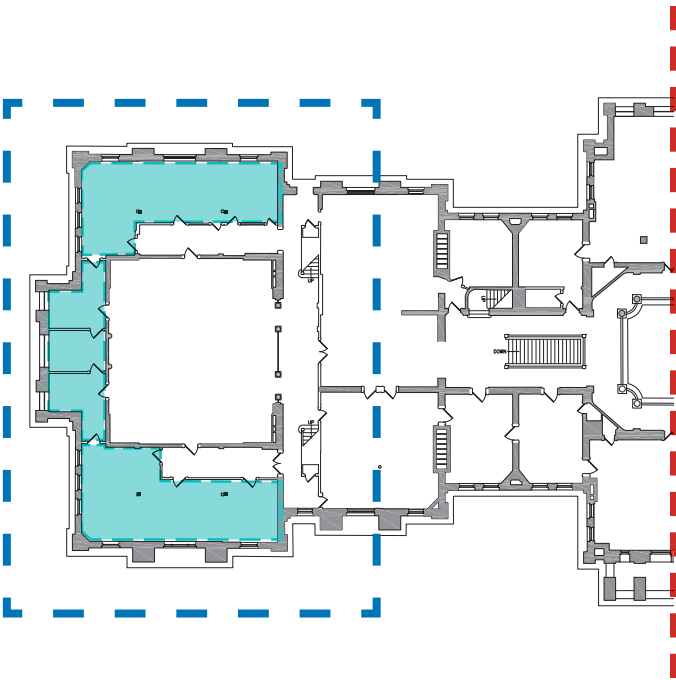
Second Floor Level Selective Removals Plan.
